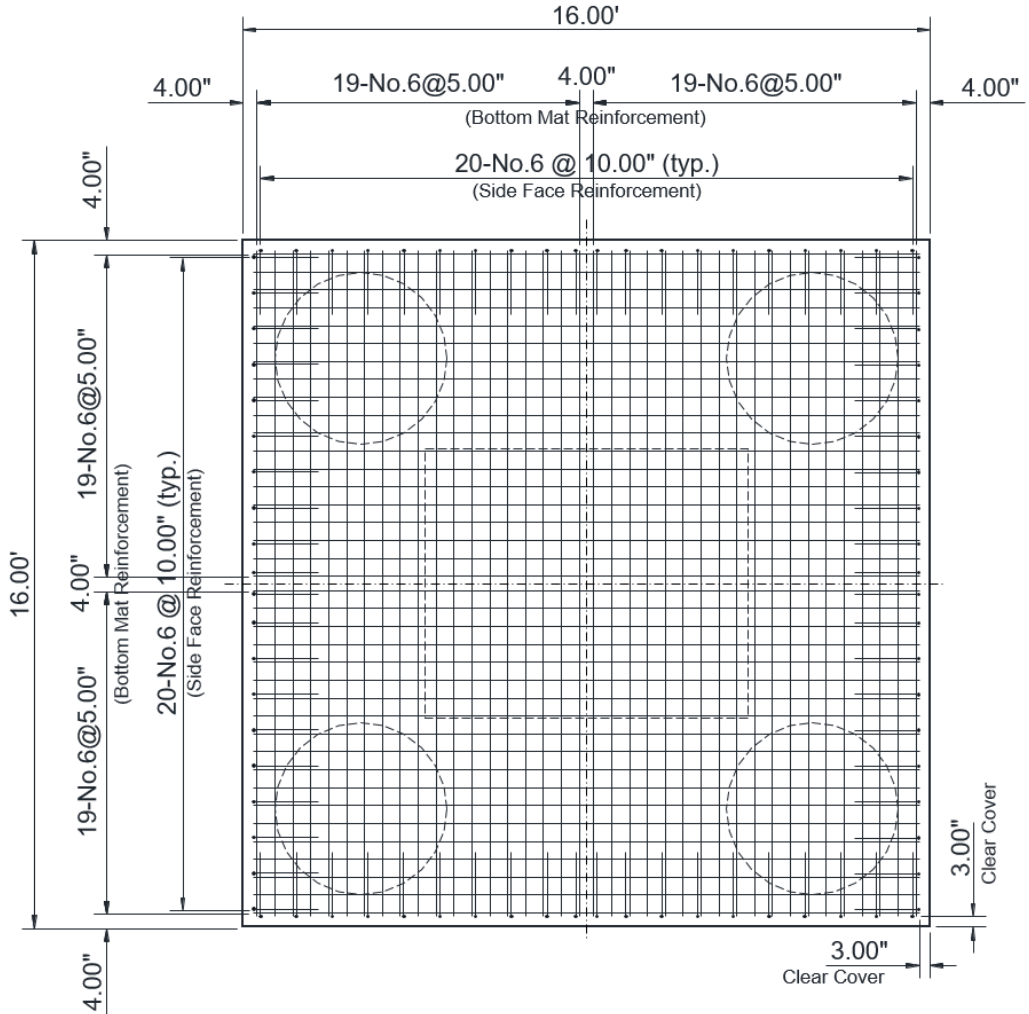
Reinforcement details for bottom mat reinforcement: plan view
